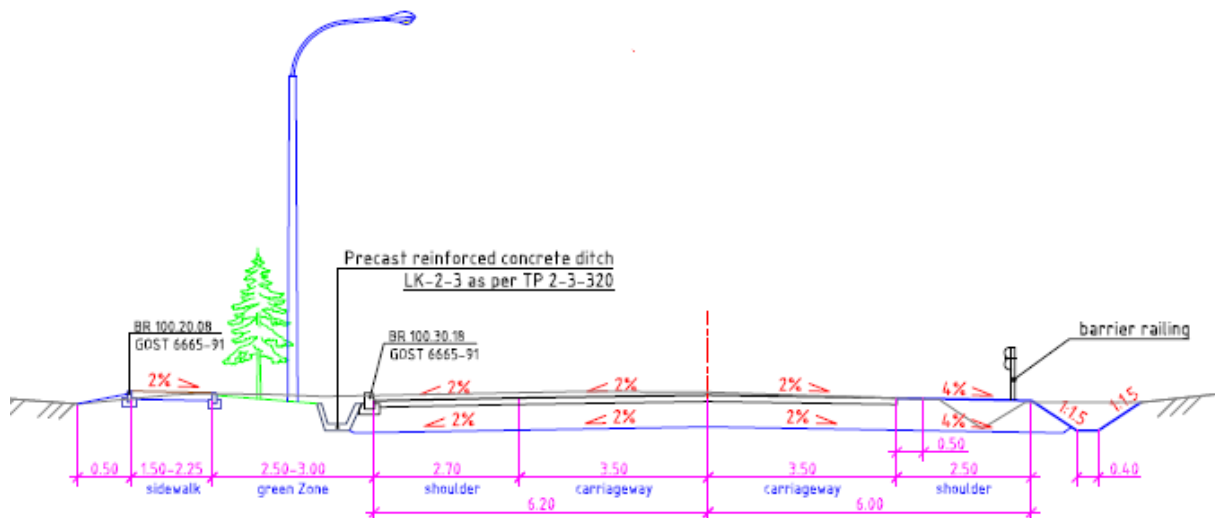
Typical cross section in rural area (category III) of Dangara-Okmazor road section km 40.0 - km 68.7
